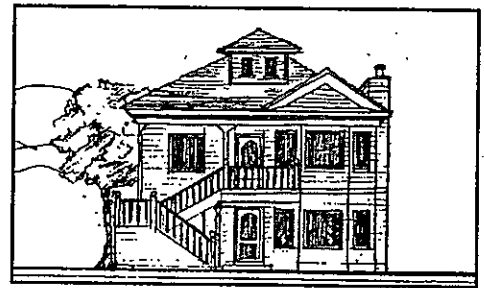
Maximum building height of three stories may be permitted if compatible with existing residences.
